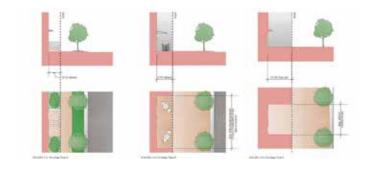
Typical commercial/residential frontage showing a recessed entry and walled garden beyond
